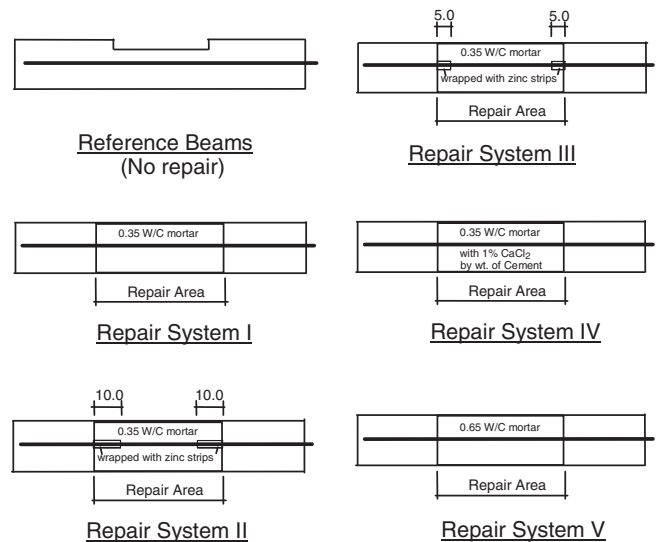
Repair systems of concrete specimens (CS groups, unit: cm).
